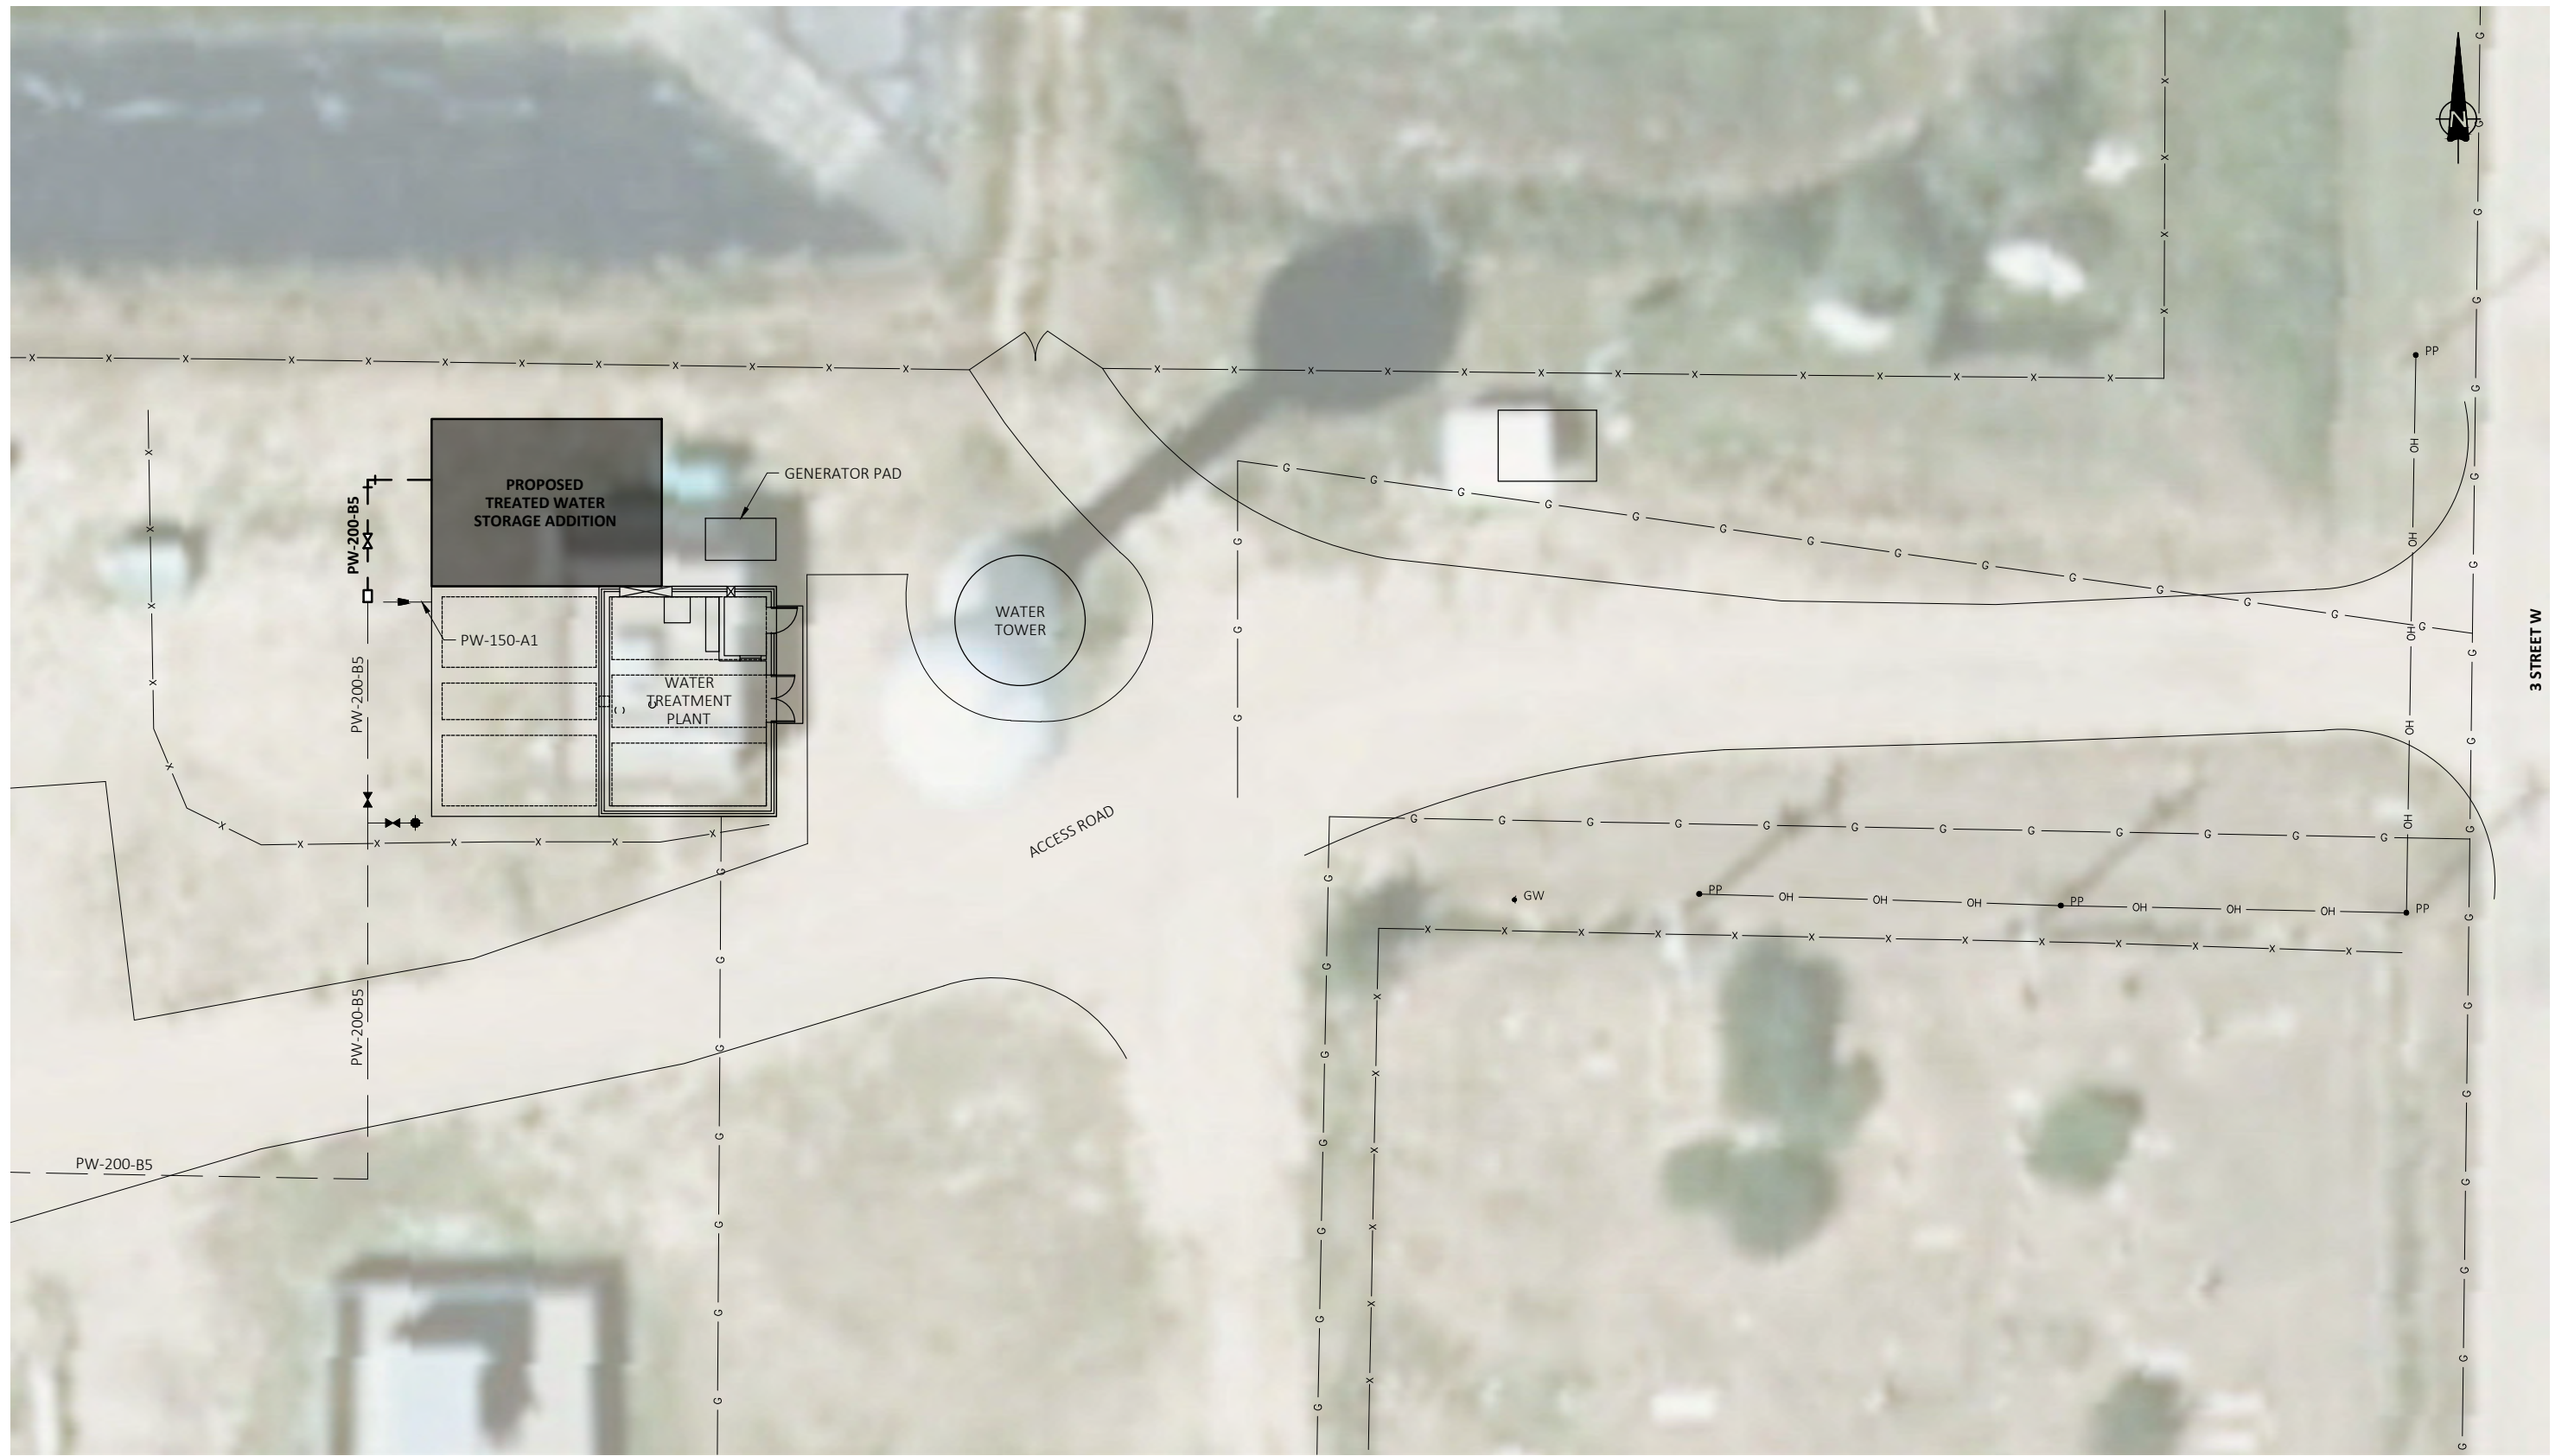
provides a conceptual site plan with tie-ins to the existing Coutts Reservoir Pump House.
